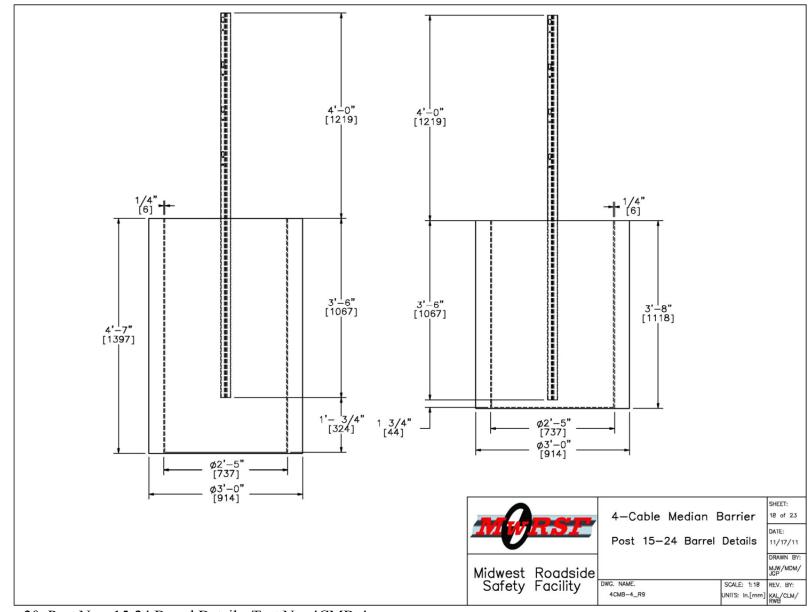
Post Nos. 15-24 Barrel Details, Test No. 4CMB-4
